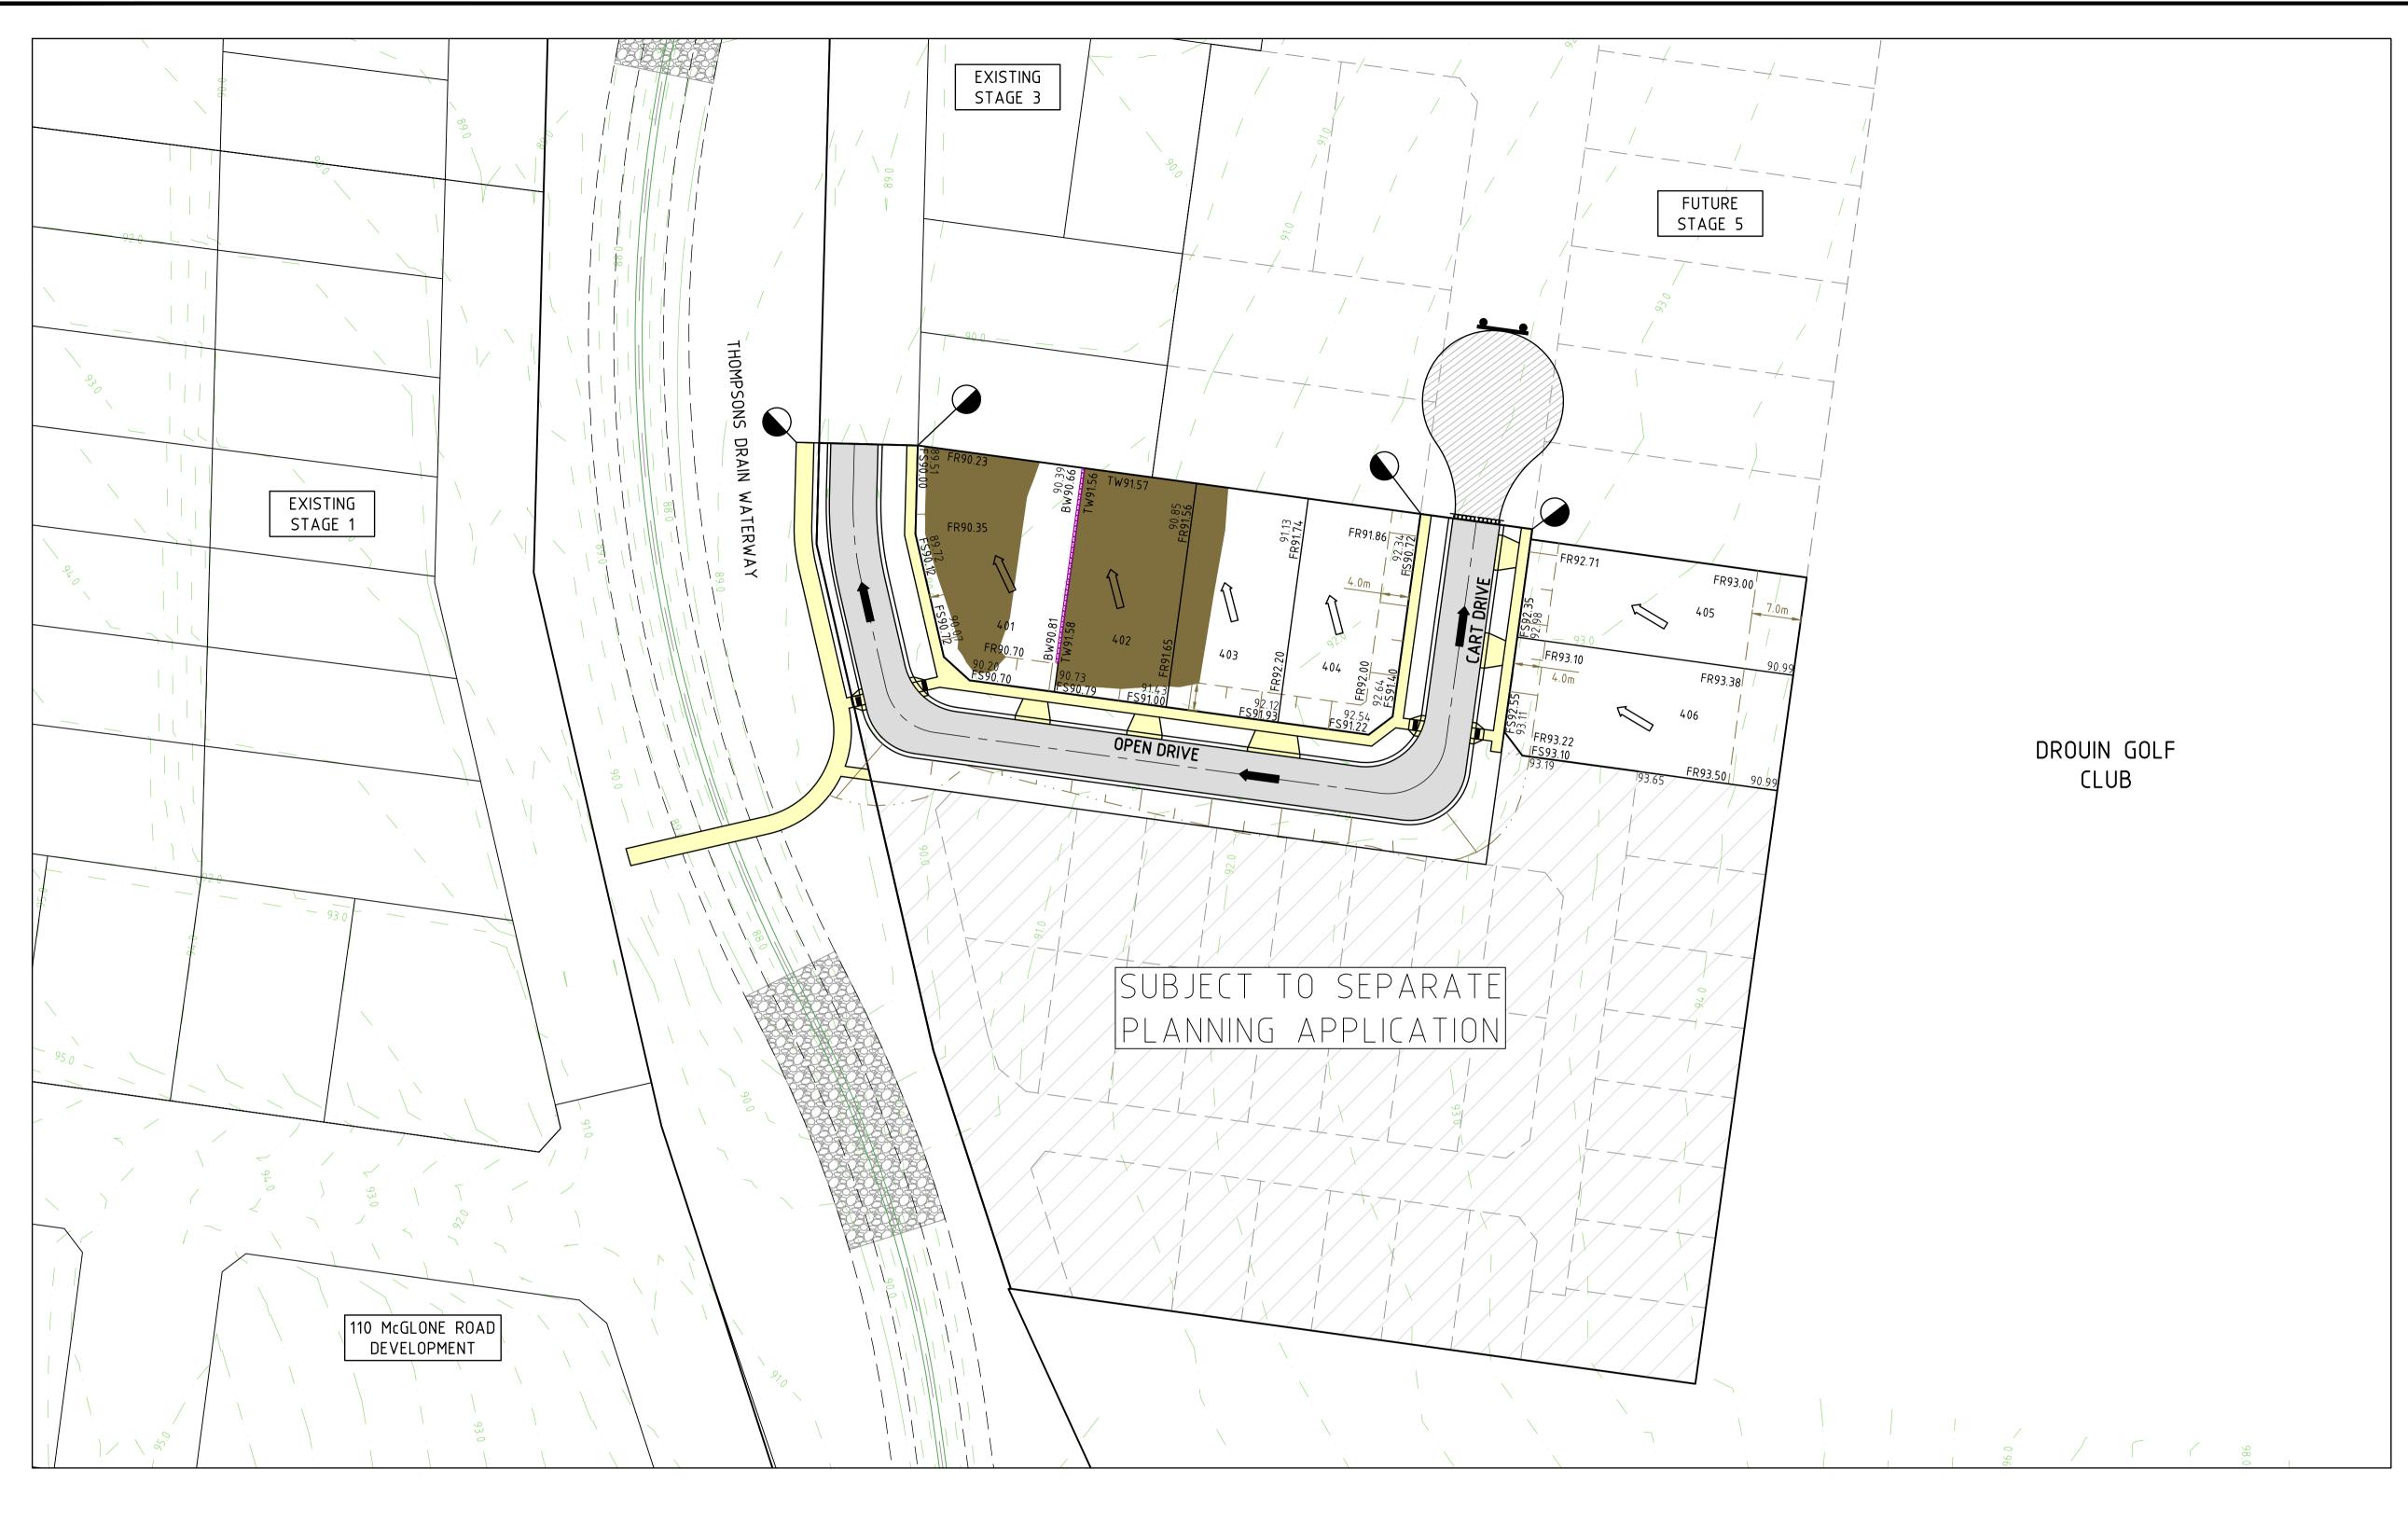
DETAILED DESIGN - STAGE 4 BAW BAW SHIRE COUNCIL - PLA0382/16 ROADWORKS AND DRAINAGE MASTER SERVICES PLAN
